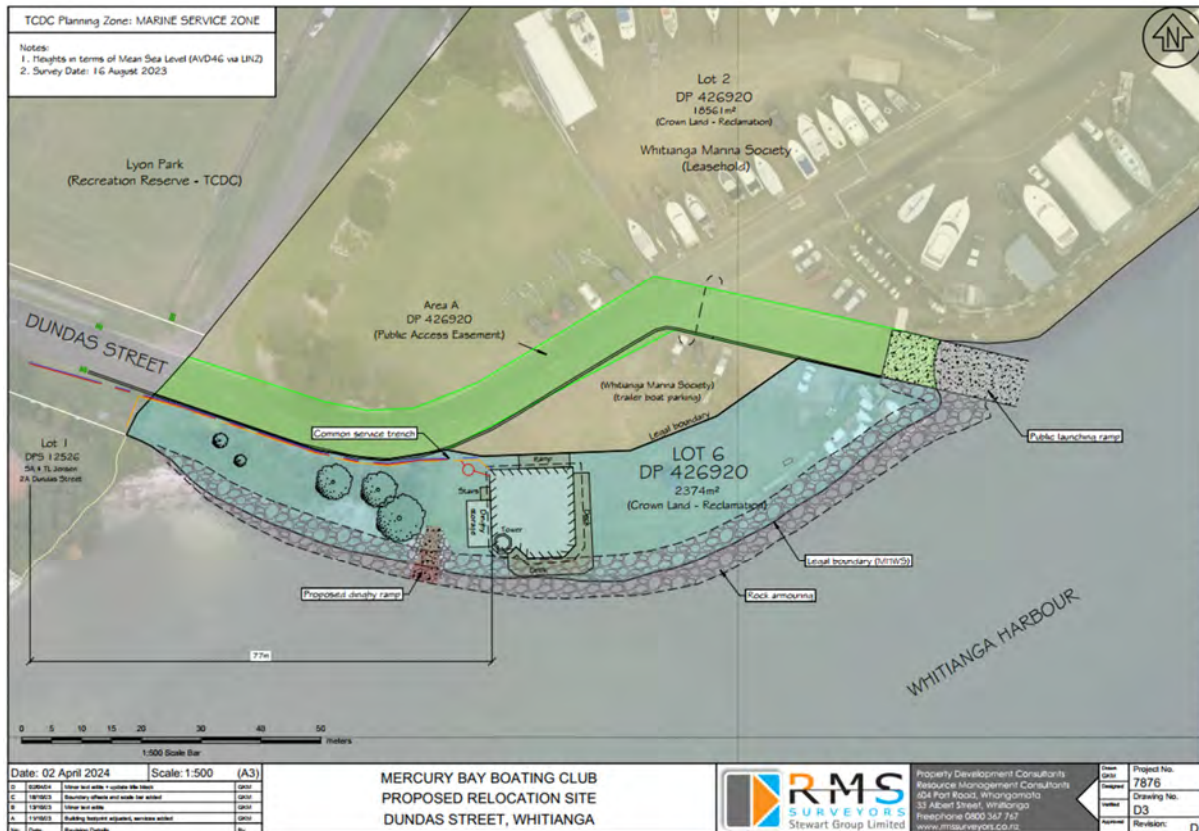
Proposed site at the Southern Reclamation / Dundas Street Reserve, Whitianga
